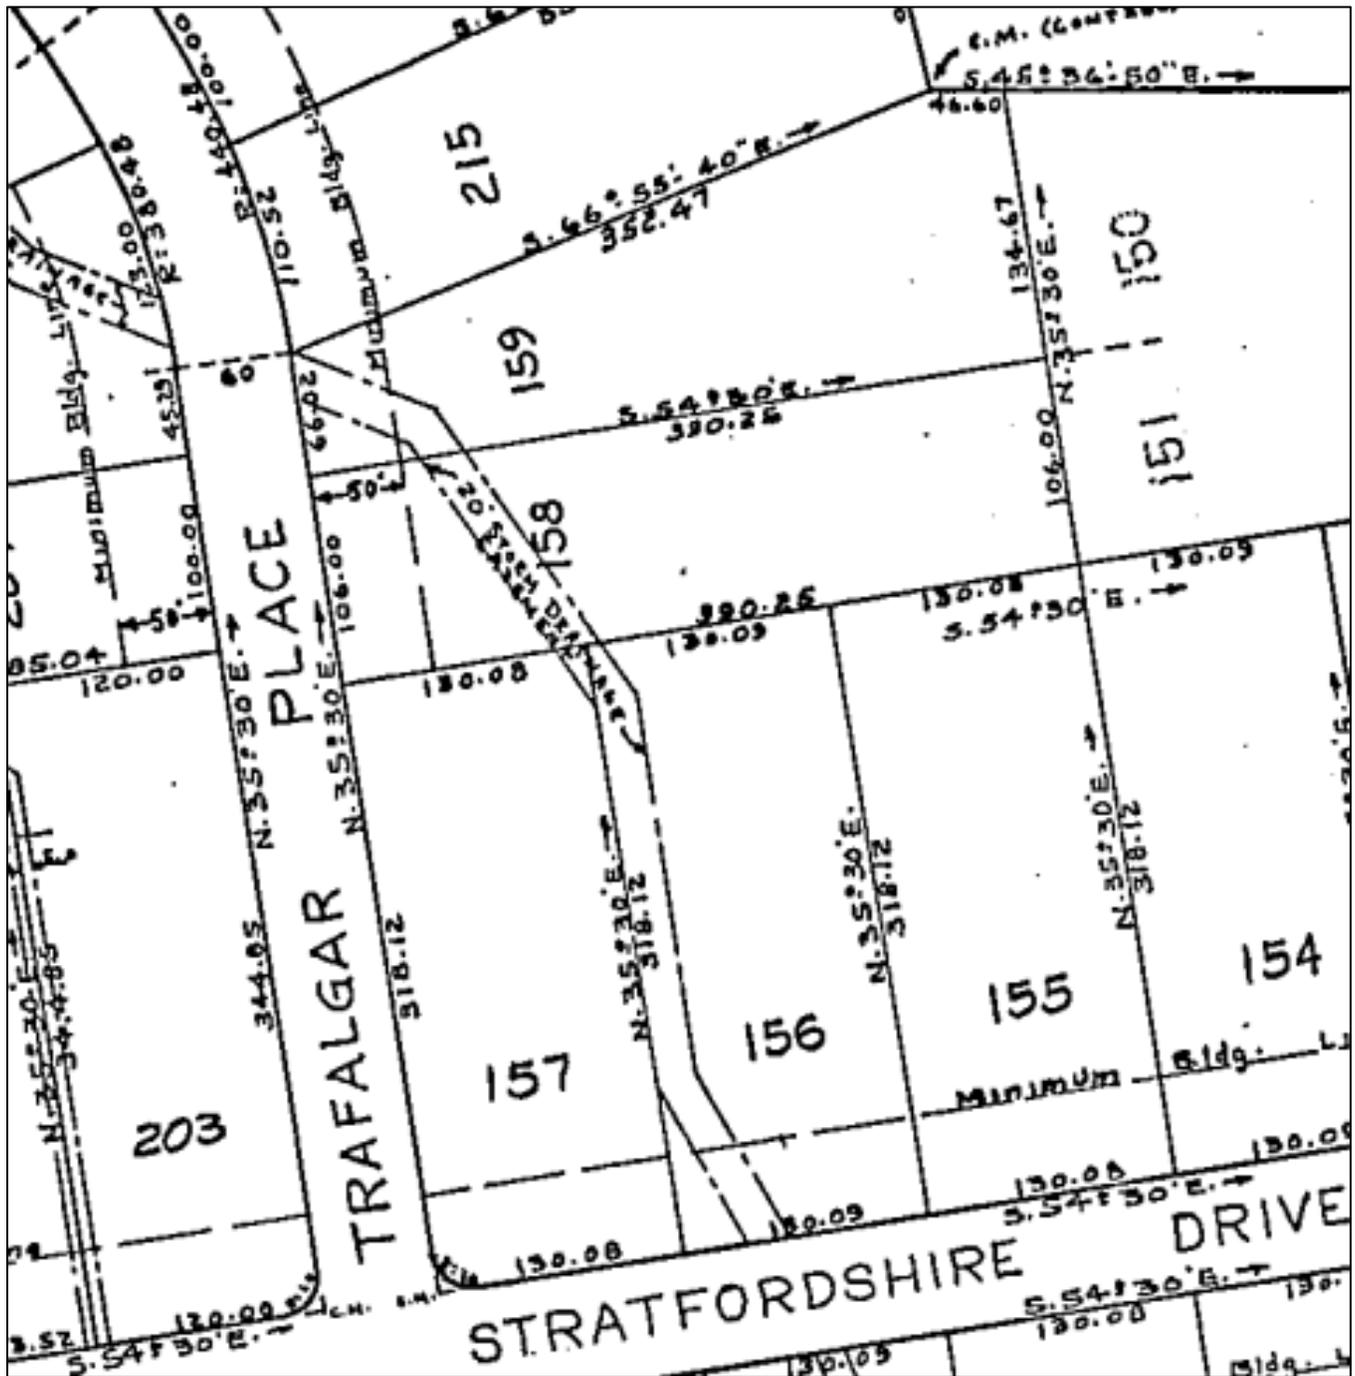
Recorded plat from 1969 showing the original layout of lots 158 and 159
